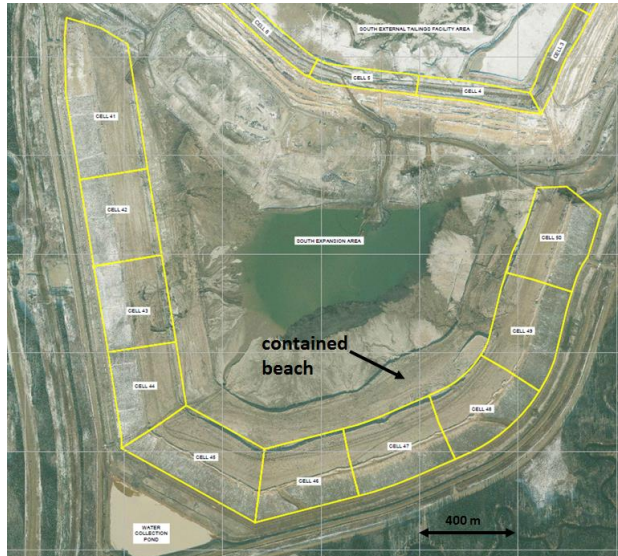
MRM External Tailings Facility South Expansion Area showing construction cells (November 2015).
